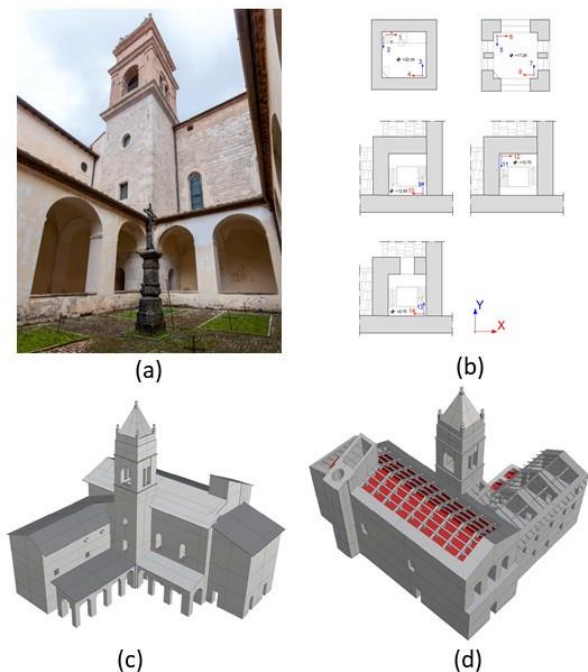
a) Bell Tower view of the San Bartolomeo church; b) layout of the sensor at each floor; c-d) 3D model of the church aggregate
